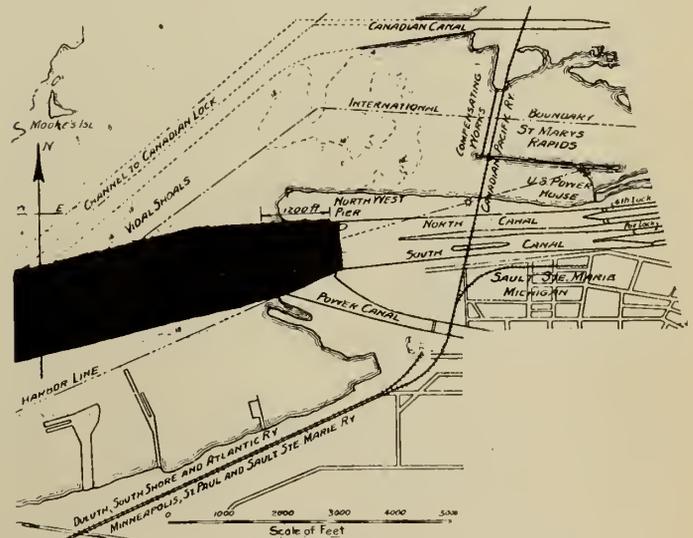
Proposed Extension of Northwest Pier, St. Mary's Falls Canal.
